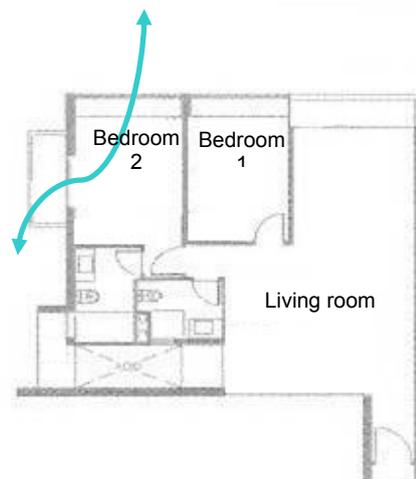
Dwelling unit layout showing only bedroom 2 is considered to have true cross ventilation. Living room and bedroom 1 are not considered meeting the requirement 1-2(a) Option 2(i)
